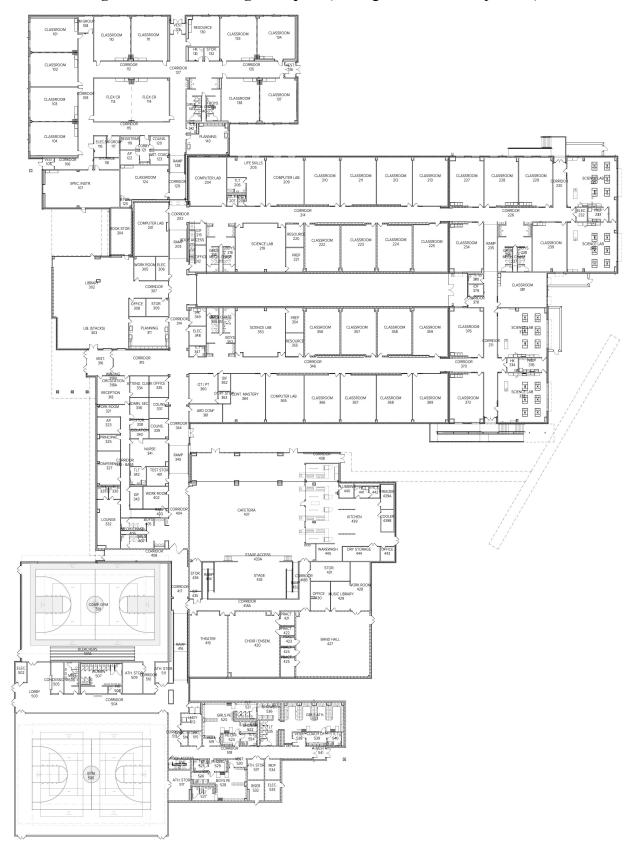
JMS Existing Floorplan (Through 2021 Bond Expansion)
